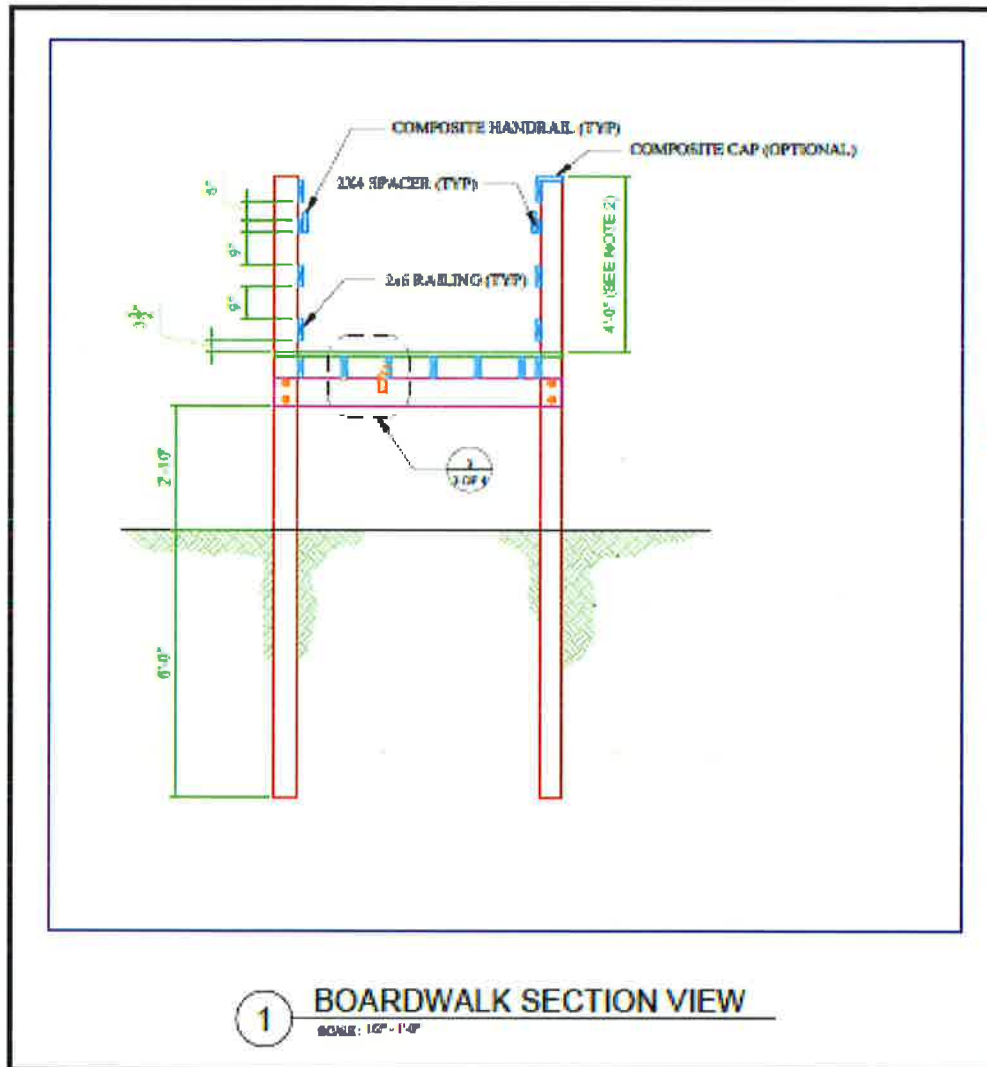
Proposed Boardwalk Section View. Note the 2' 10"-foot freeboard of the boardwalk deck above natural grade.
